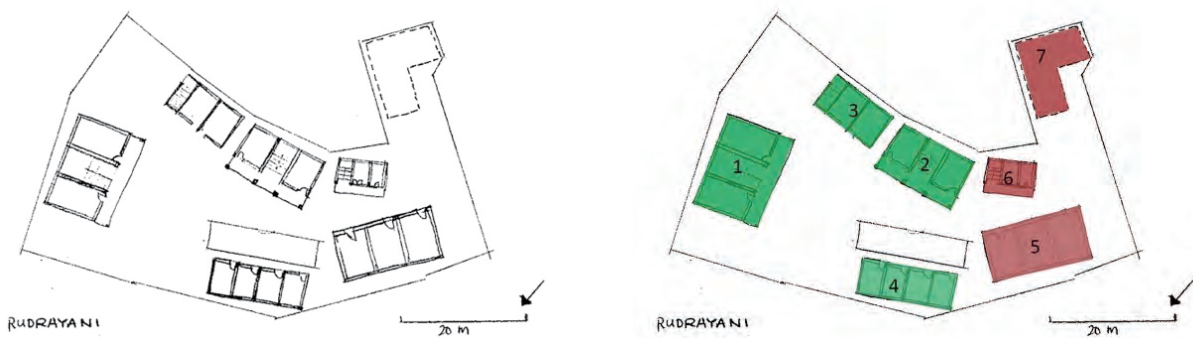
Layout of Buildings at Rudrayanee Secondary School (Diagram: Maly)
